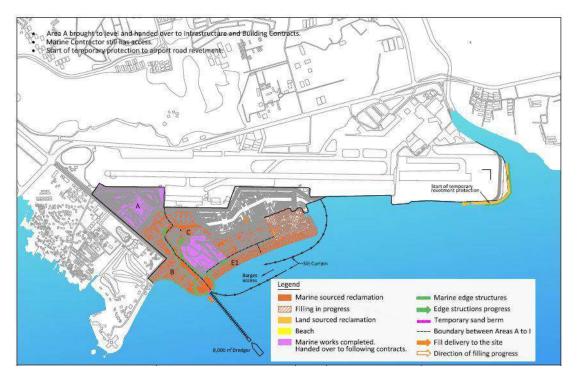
Drawing No 102 - works progressing south with Prince Philip Park and the first section of beach filled
